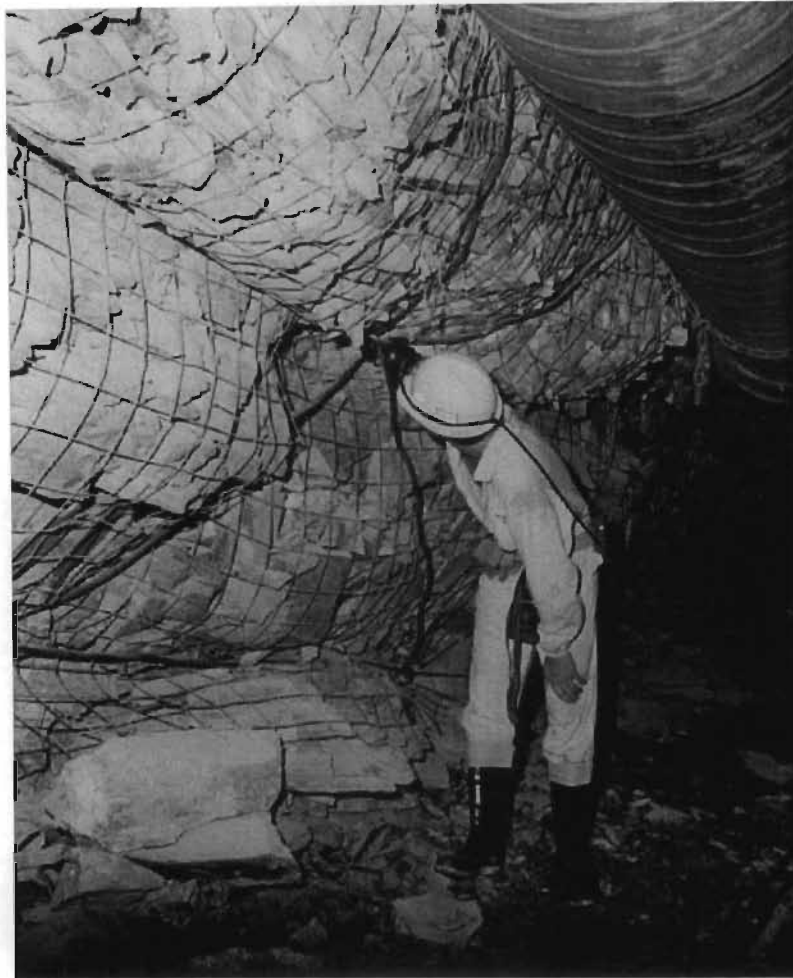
View east along 34 level deep footwall drive indicating rockburst damage to the tunnel excavation. Note crushing of metal ventilation tubes on left hand side.
